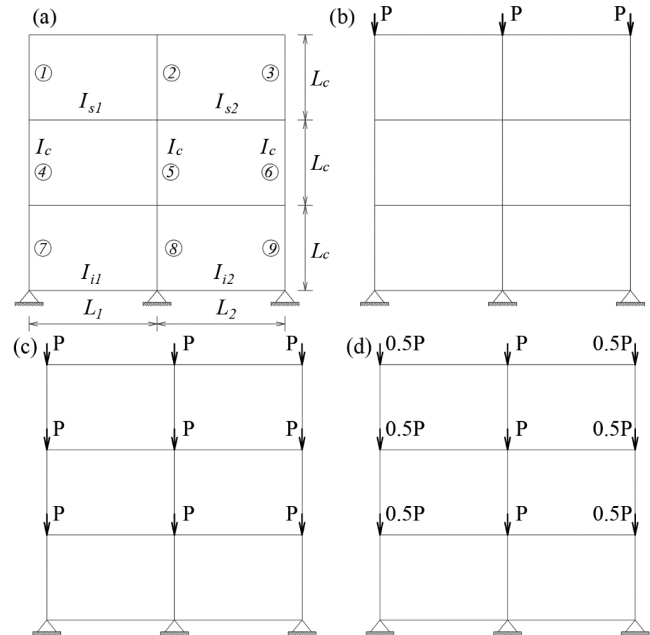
Three-story frame: (a) frame model, (b) load case 1, (c) load case 2, (d) load case 3
